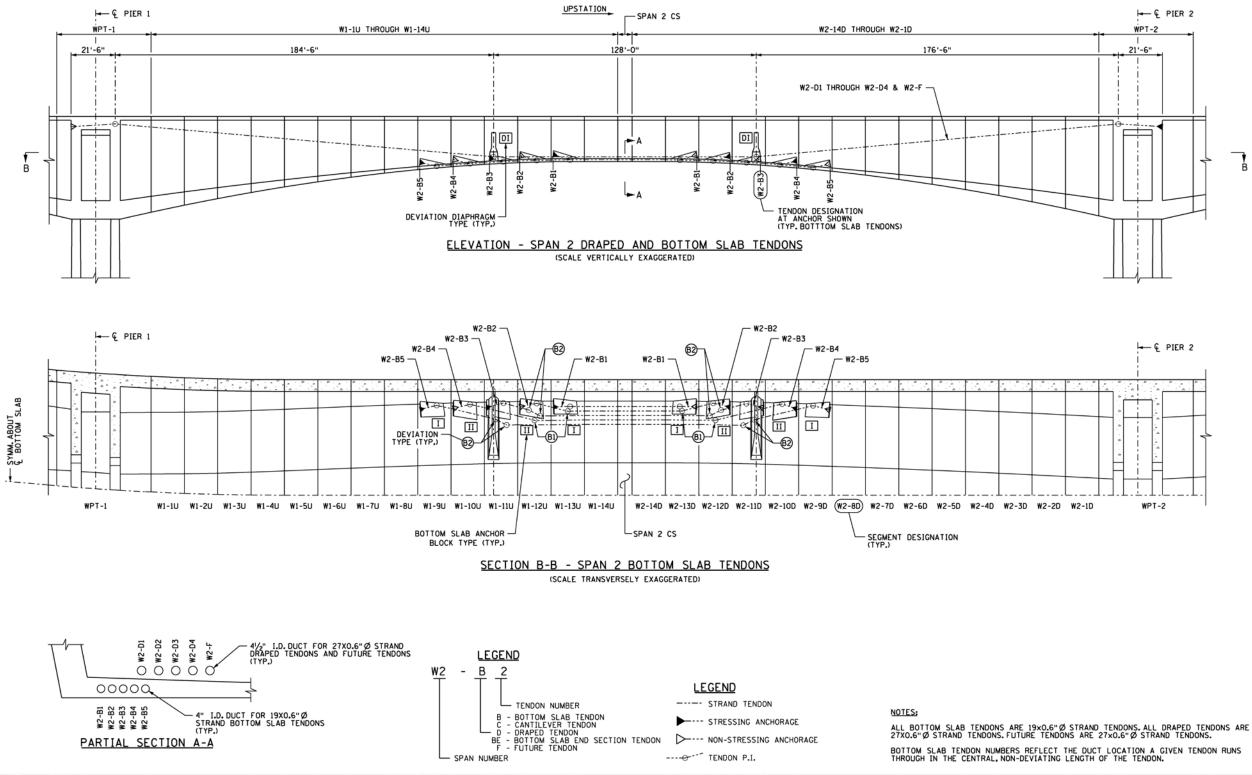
Westbound Span 2 Draped and Bottom Slab Post-Tensioning Layout
